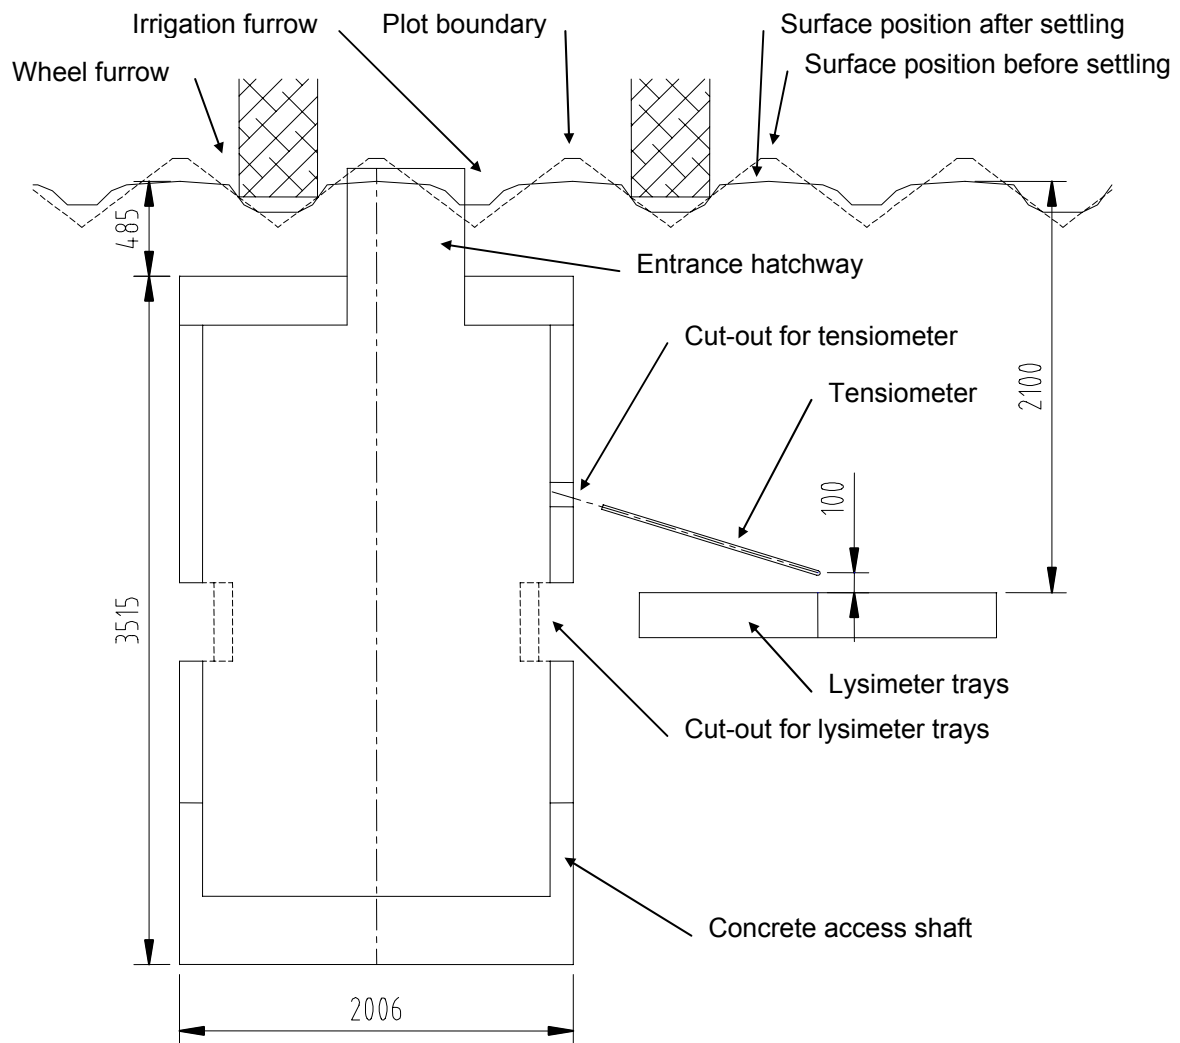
Vertical cross-section through the centre of the access shaft at 90° to the furrows. Dimensions in millimetres.
